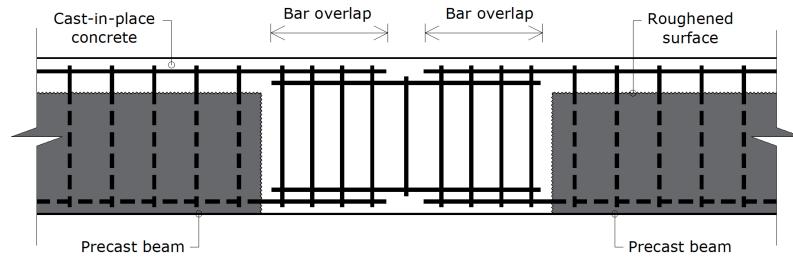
Beam-to-beam connection with double-straight bar laps
